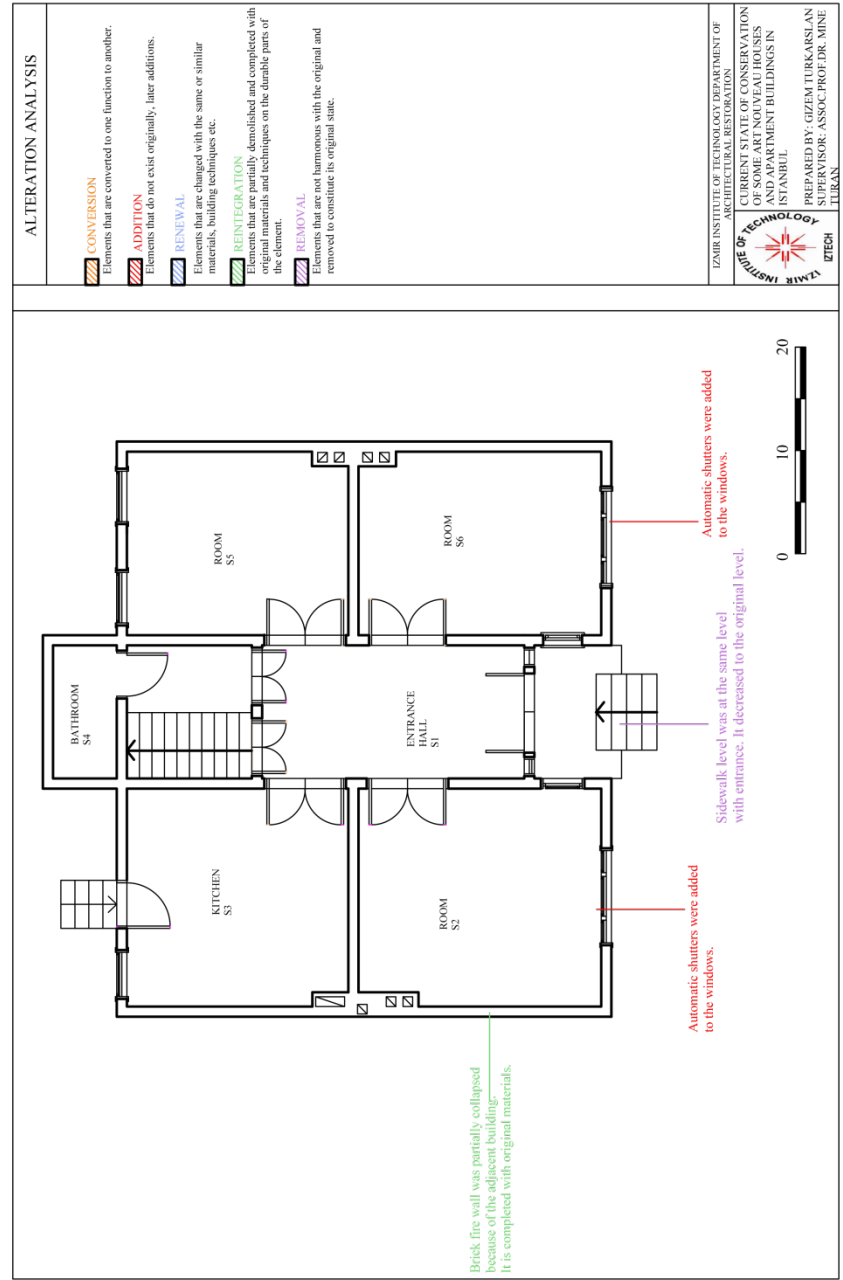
Ground Floor Plan, Alteration Analysis of Dikranyan Yalı
